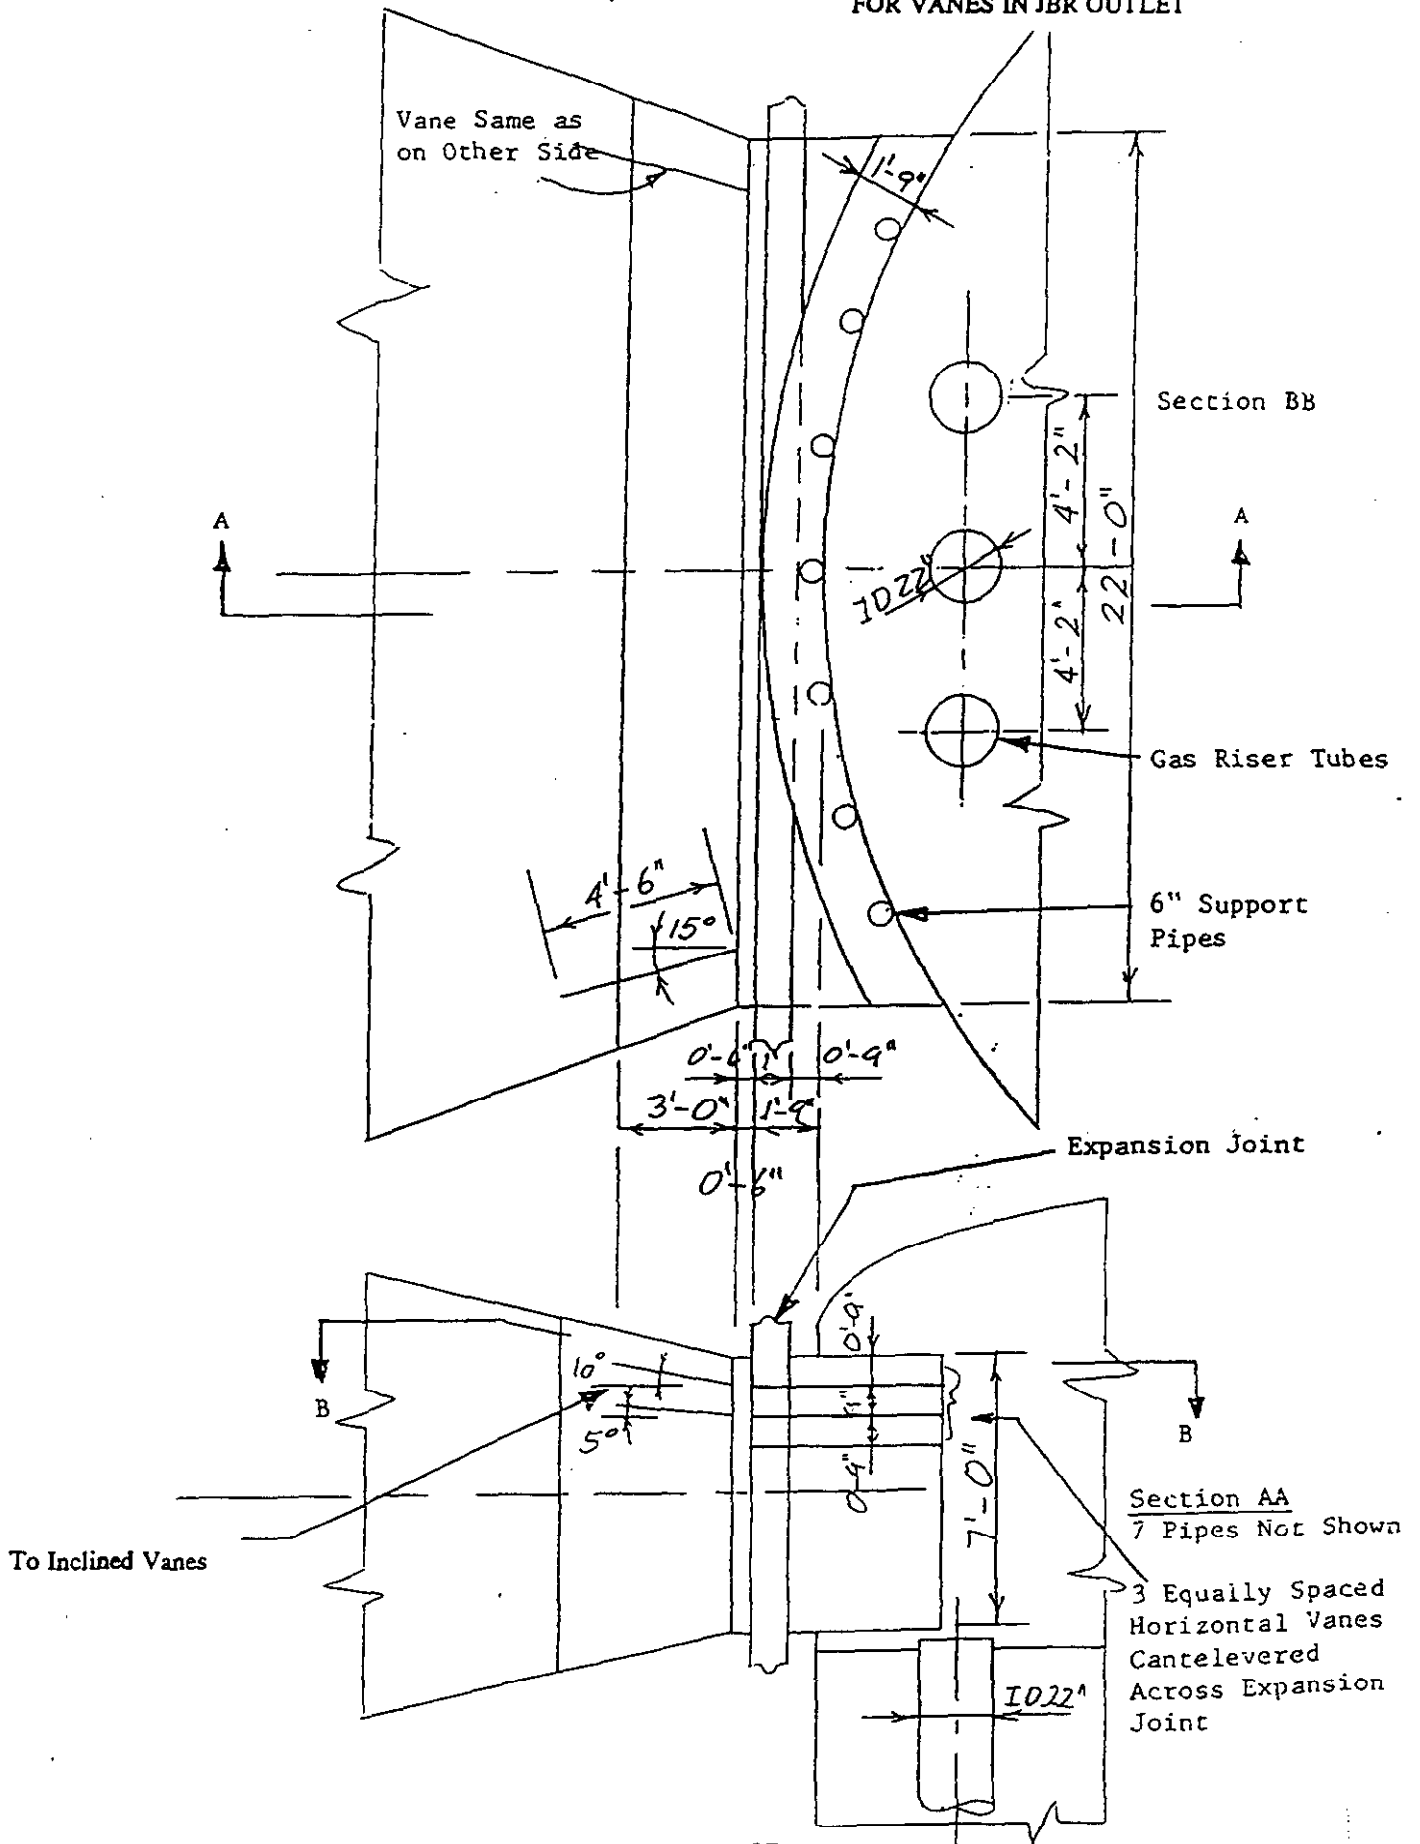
FIELD DIMENSIONS FOR DESIGN NO. 3
